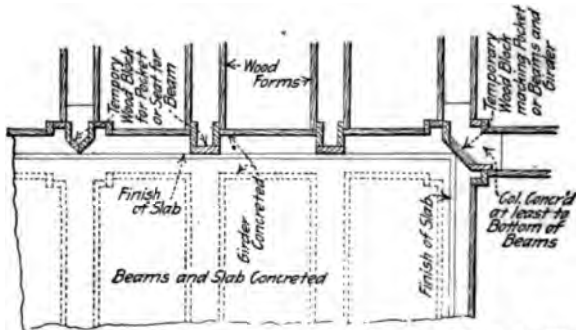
Arrangement of Forms for Stopping Concrete Work.
